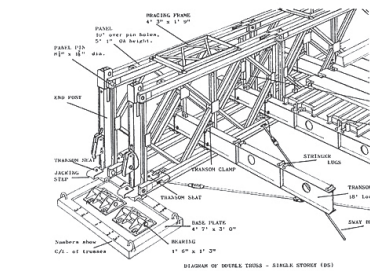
| Bailey Bridge (or Heavy Girder Bridge)
